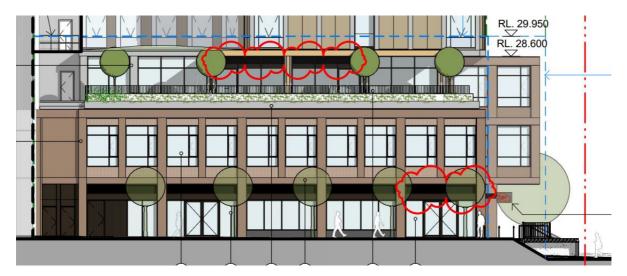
| Additional louvres on northern elevation of podium at Ground and Level 2
